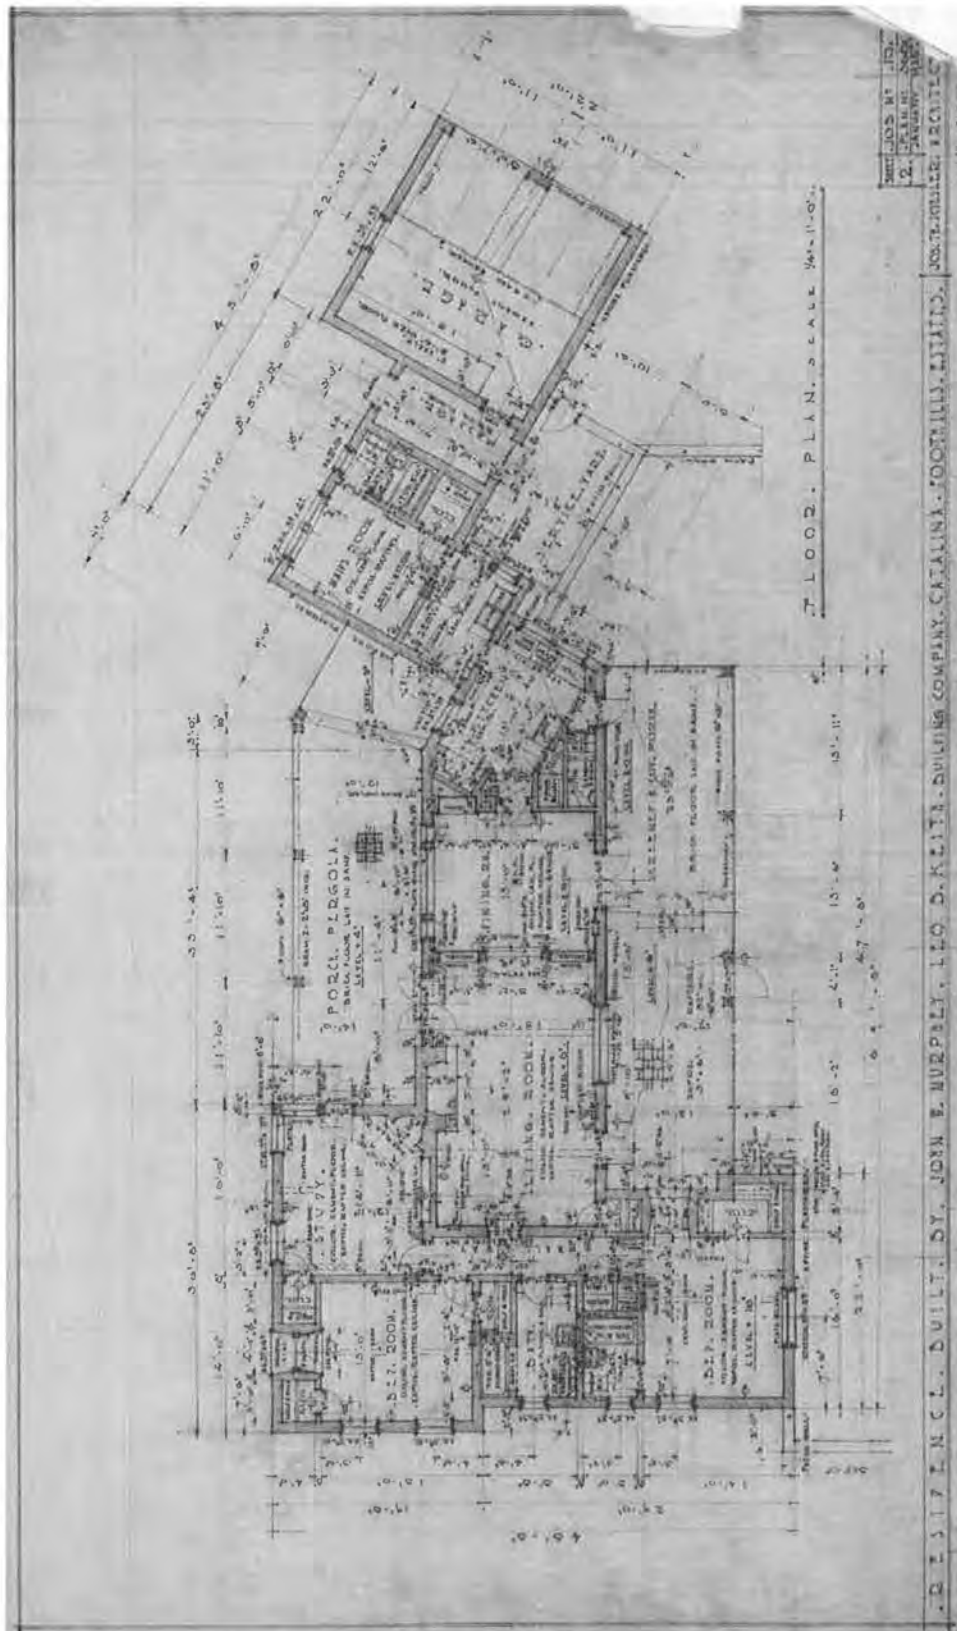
Joesler Floor Plan (Craig House) 1936, Arizona Architectural Archive
